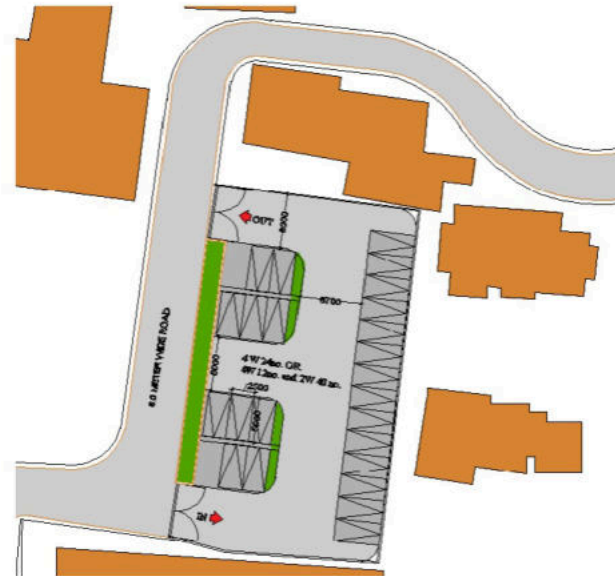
PROPOSED LAYOUT OF VISITOR'S PARKING
